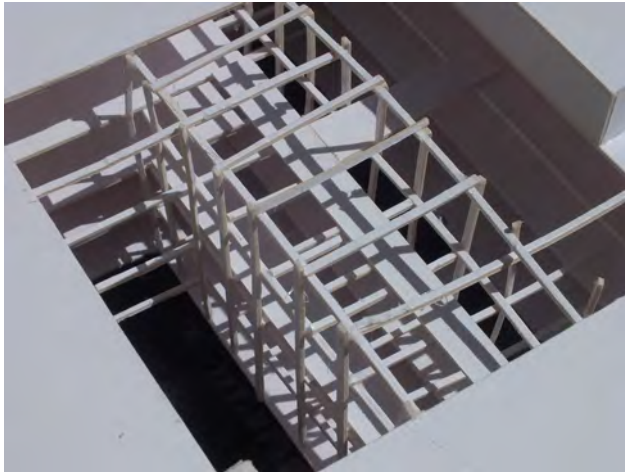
Model exploring the joining of the light wells while leaving the existing concrete frame in place
